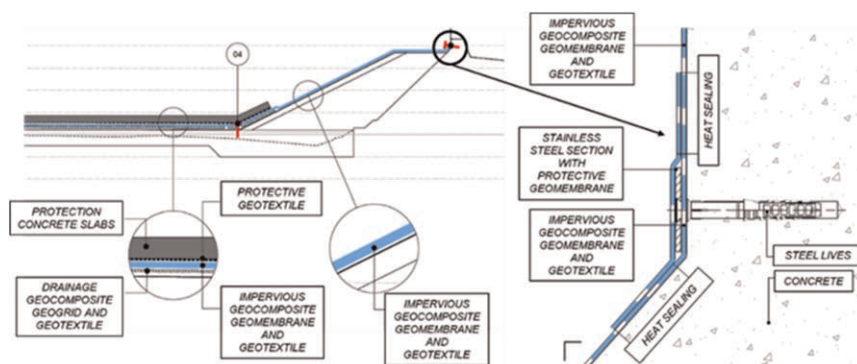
Section of the new abutment with the new facing and detail of the perimetric anchorage system.
